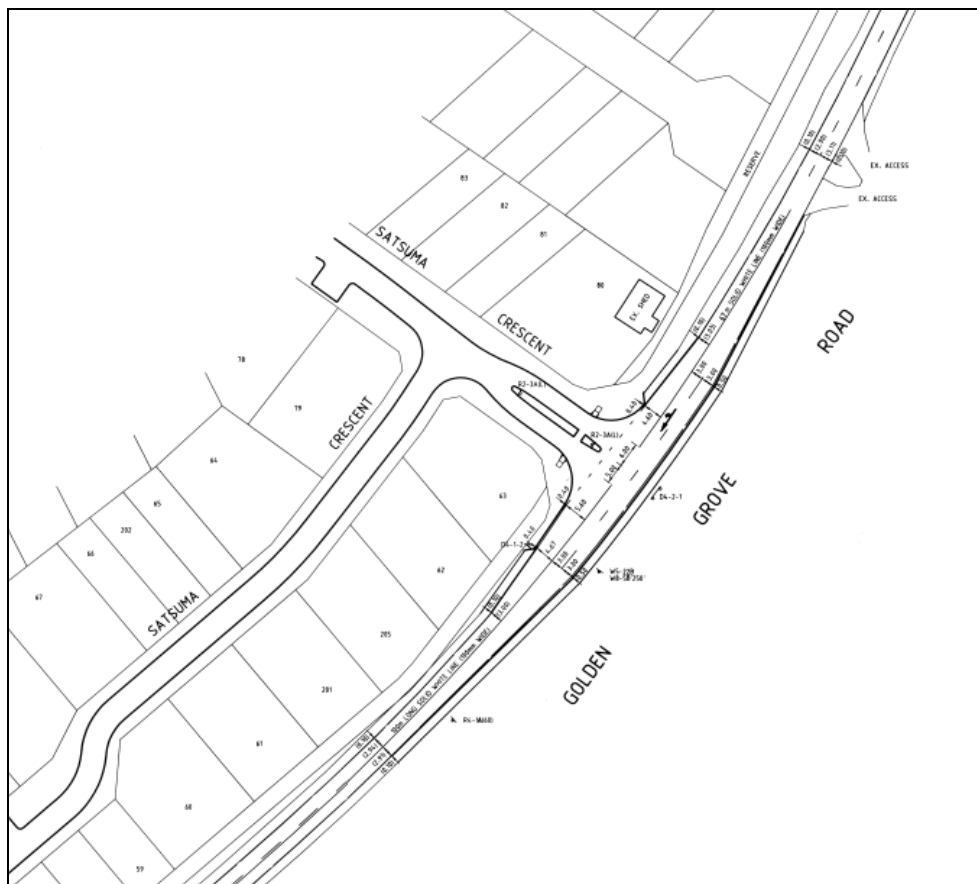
Current plan for Golden Grove Road / Satsuma Crescent Intersection
